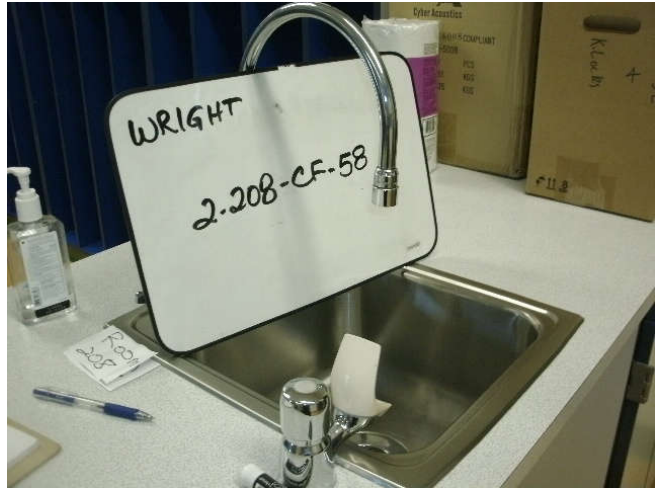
Classroom faucet w/bubbler, located on the 2nd floor, in room 208.
